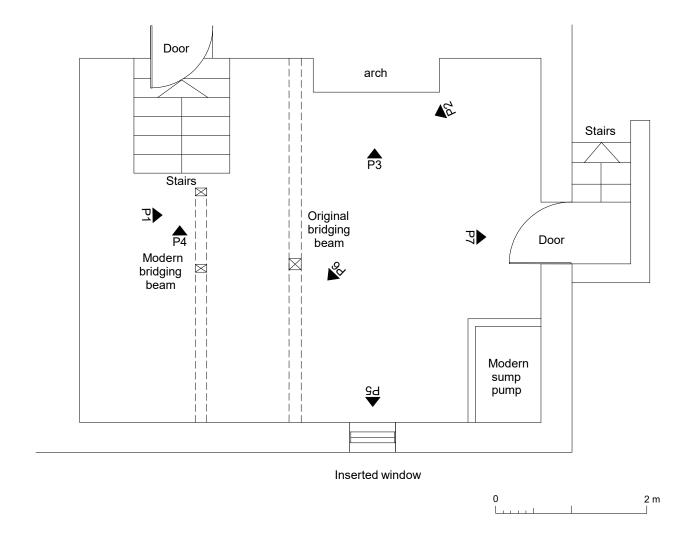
Cellar floor plan. Location and direction of photographs reproduced in text shown.
